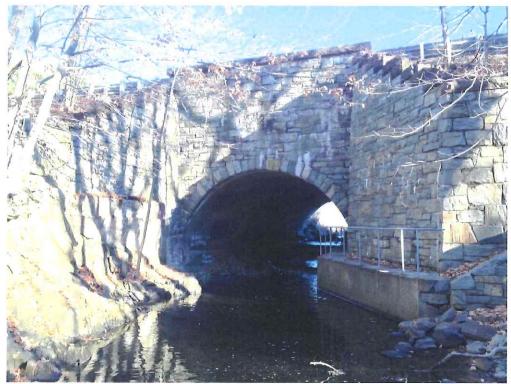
1940 southern (downstream) spandrel of Bridge #00948. The masonry clad concrete structure includes a staircase and walkway that provides access from the hiking trails to the underside of the bridge.
